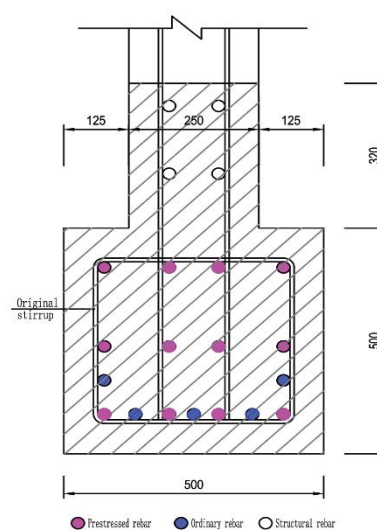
Cross-section view of prestressed concrete core rod of T-beam (mm).
